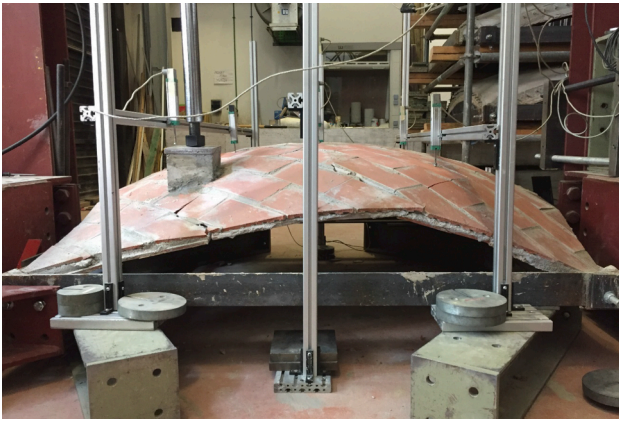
Load test setup of the plain, tile-vaulted sail domes.
